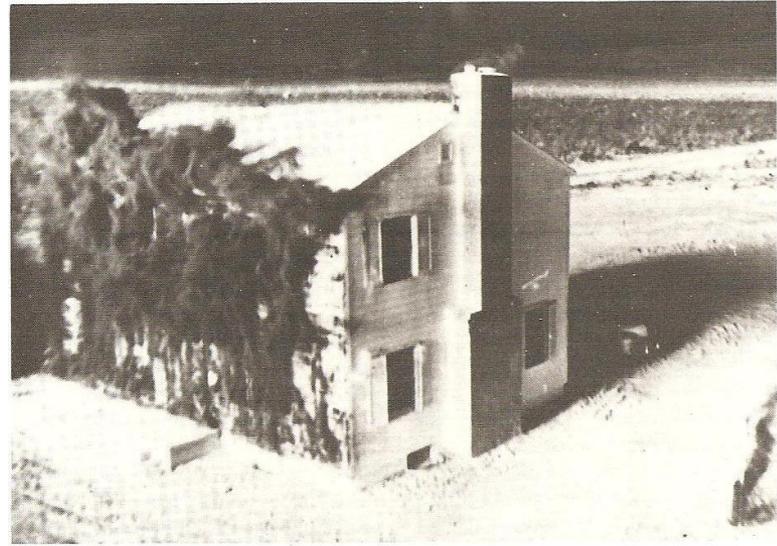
Thermal effects on wood-frame house 1 second after explosion (about 25 cal/cm²).
